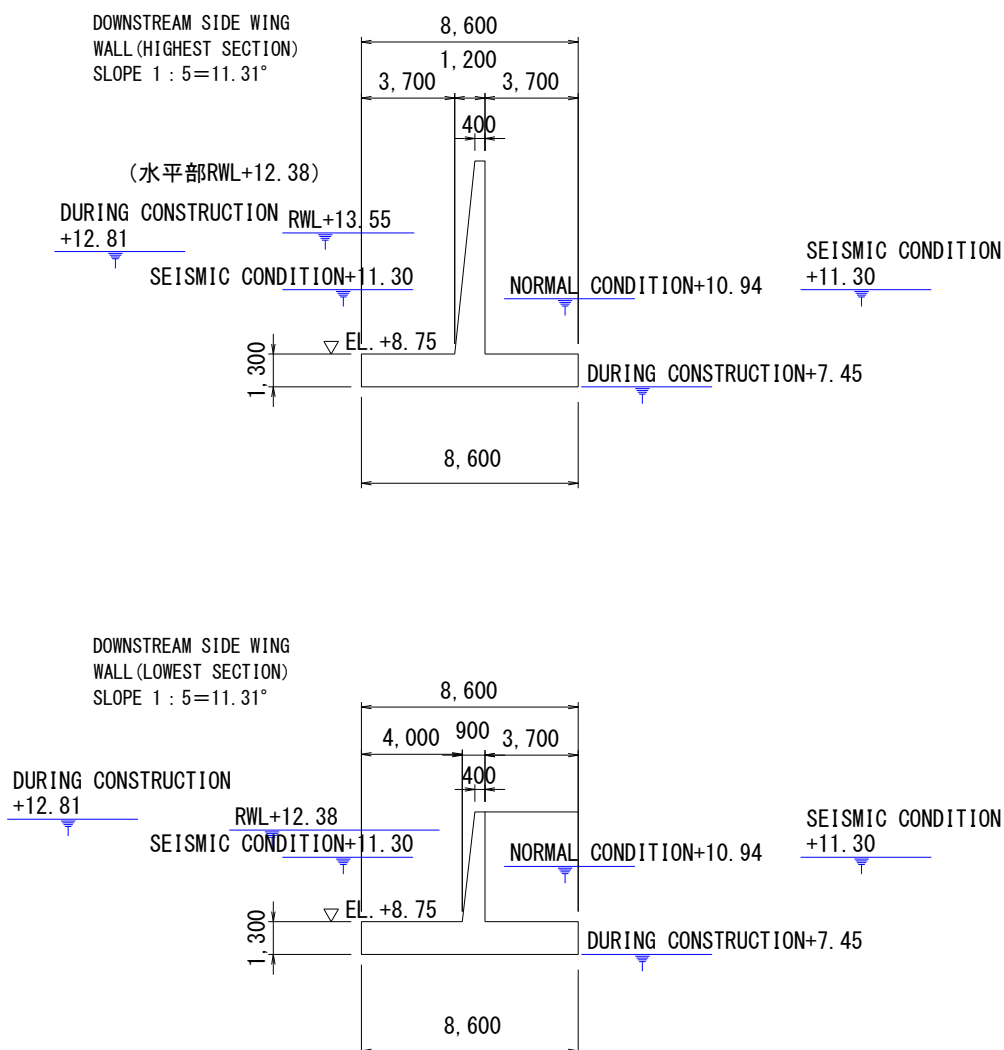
Structural Dimensions of the Downstream Wing Wall
